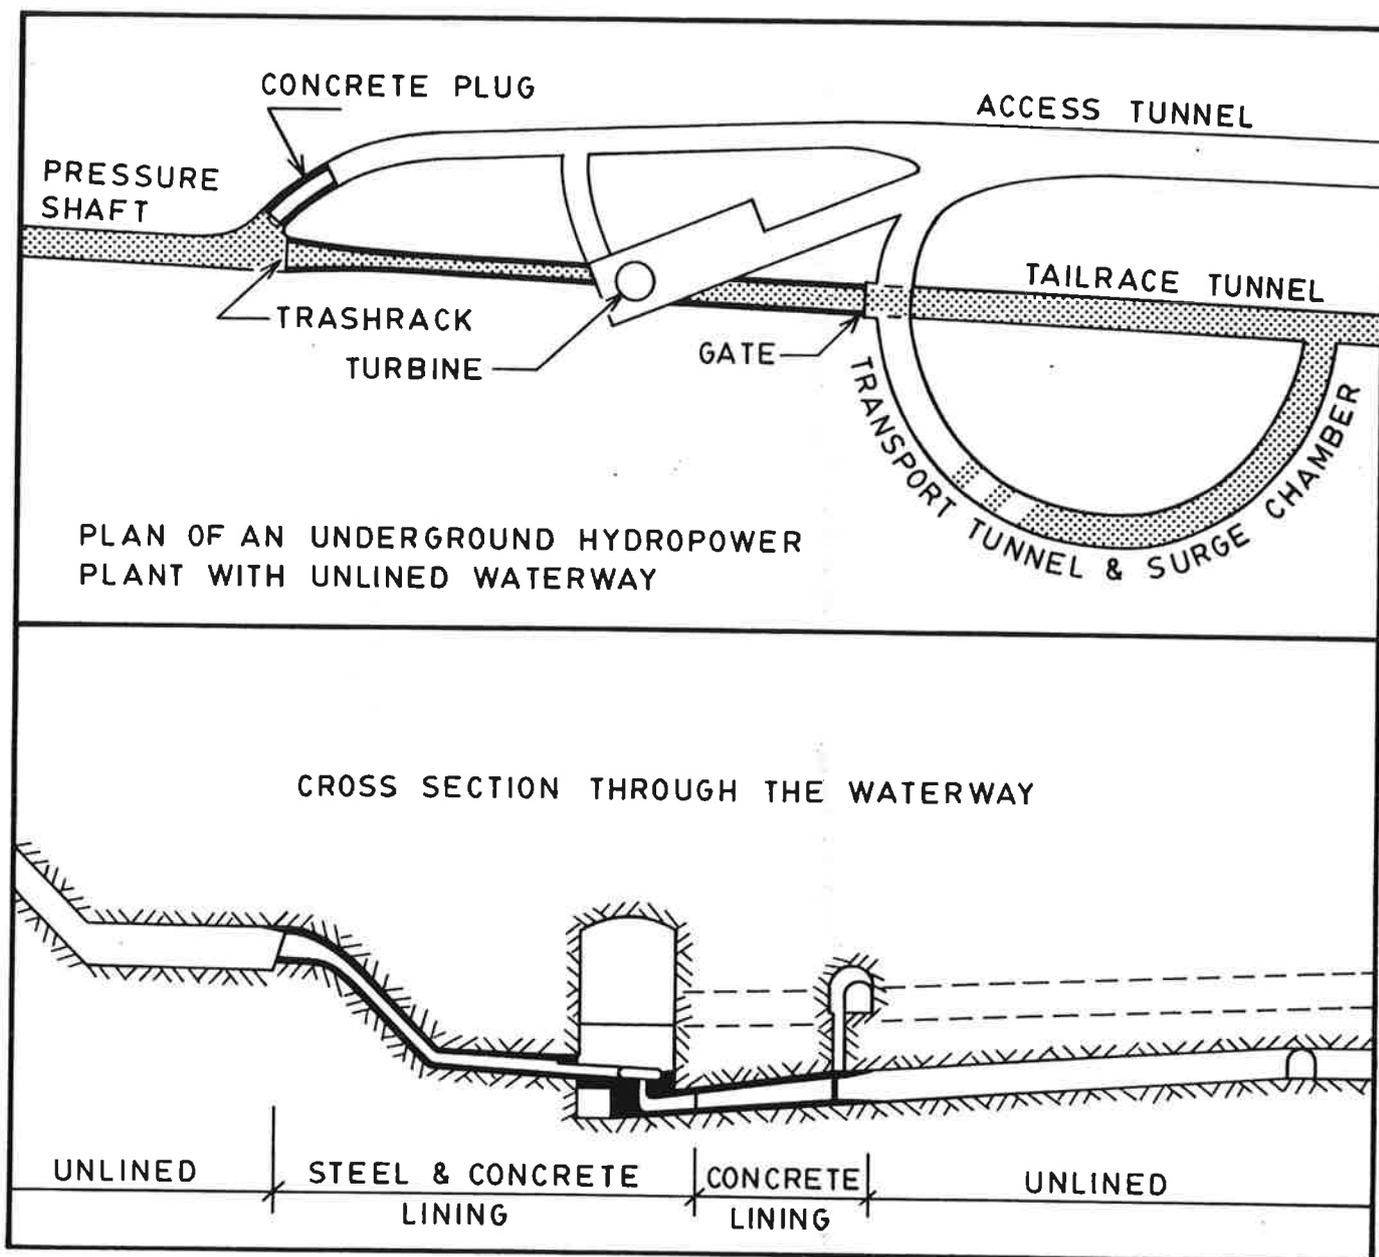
Plan and cross section of an underground hydropower plant with unlined waterways.
